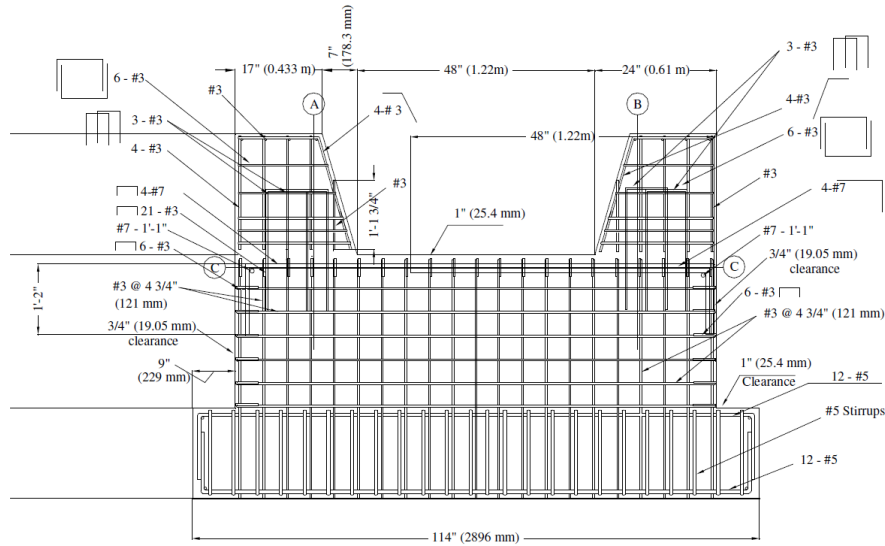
Elevation view of design details for Specimen 6 (from Bauer, 2006)
